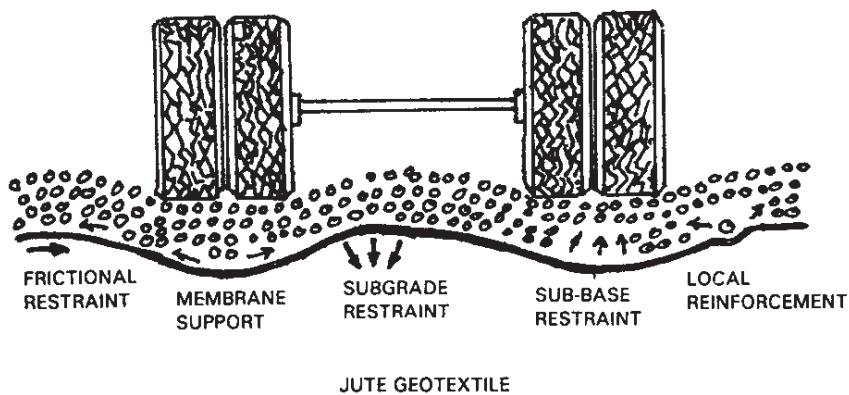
JUTE GEOTEXTILE STABILIZATION OF AN UNPAVED ROAD
